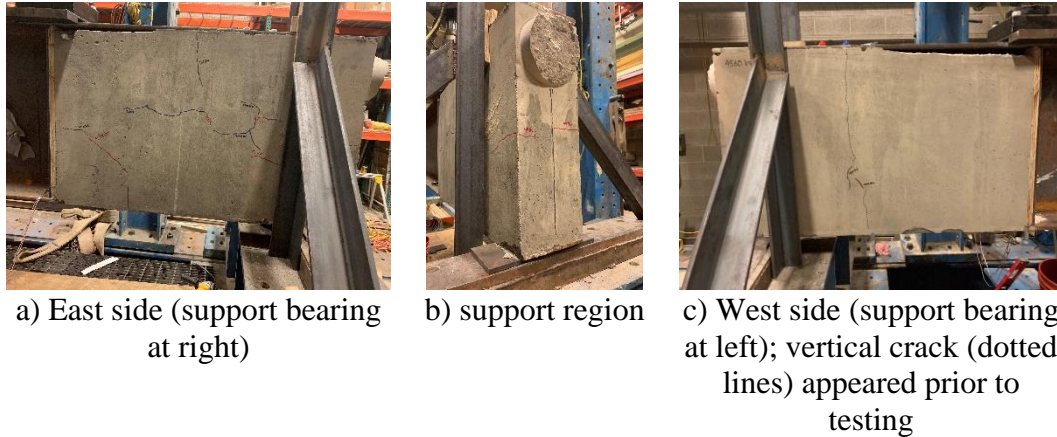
Cracking Observed during Fatigue Conditioning of Girder 5B
